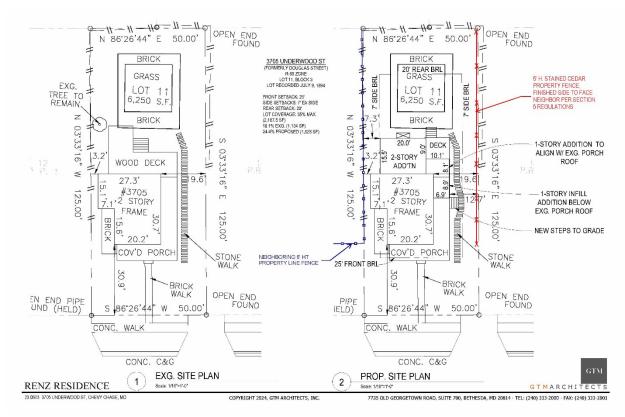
The existing site plan, left, and proposed site plan, right, after the fence is installed and approved additions are constructed. The proposed fence is indicated in red on the proposed plan. The existing fence to the west at 3707 Underwood Street is indicated in blue.
